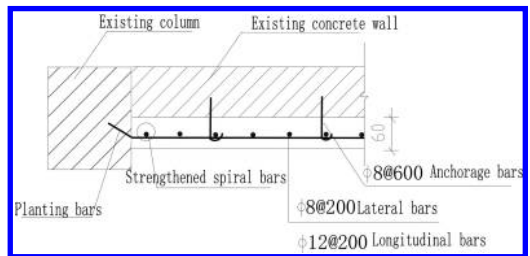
Typical detail of concrete wall strengthening with reinforced concrete layer.
